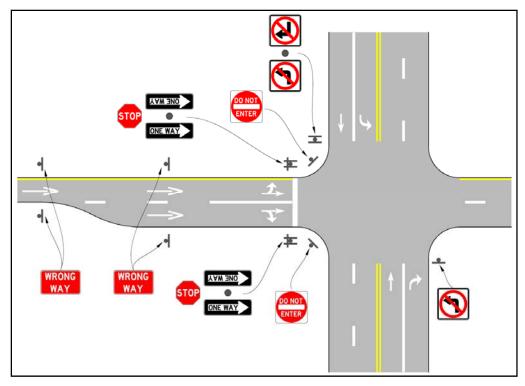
Example of signage and pavement markings at an exit ramp of a diamond interchange.
